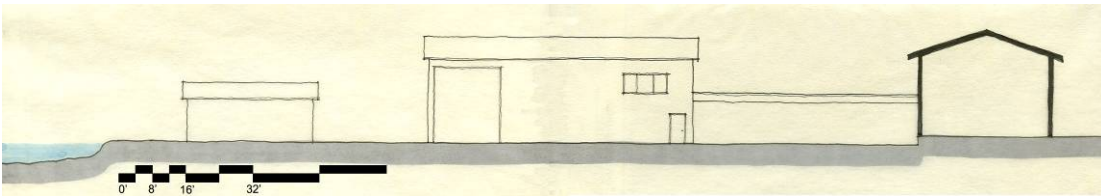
Existing site section from Salmon Bay to Shilshole Avenue through the existing Sagstaad Marina building.
